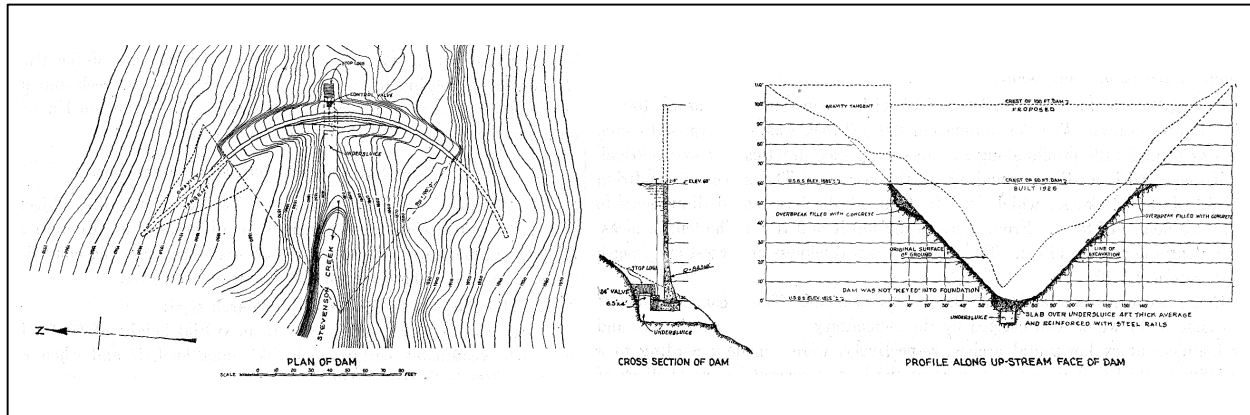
Stevenson Creek Dam: Plan, section, and profile along upstream face
